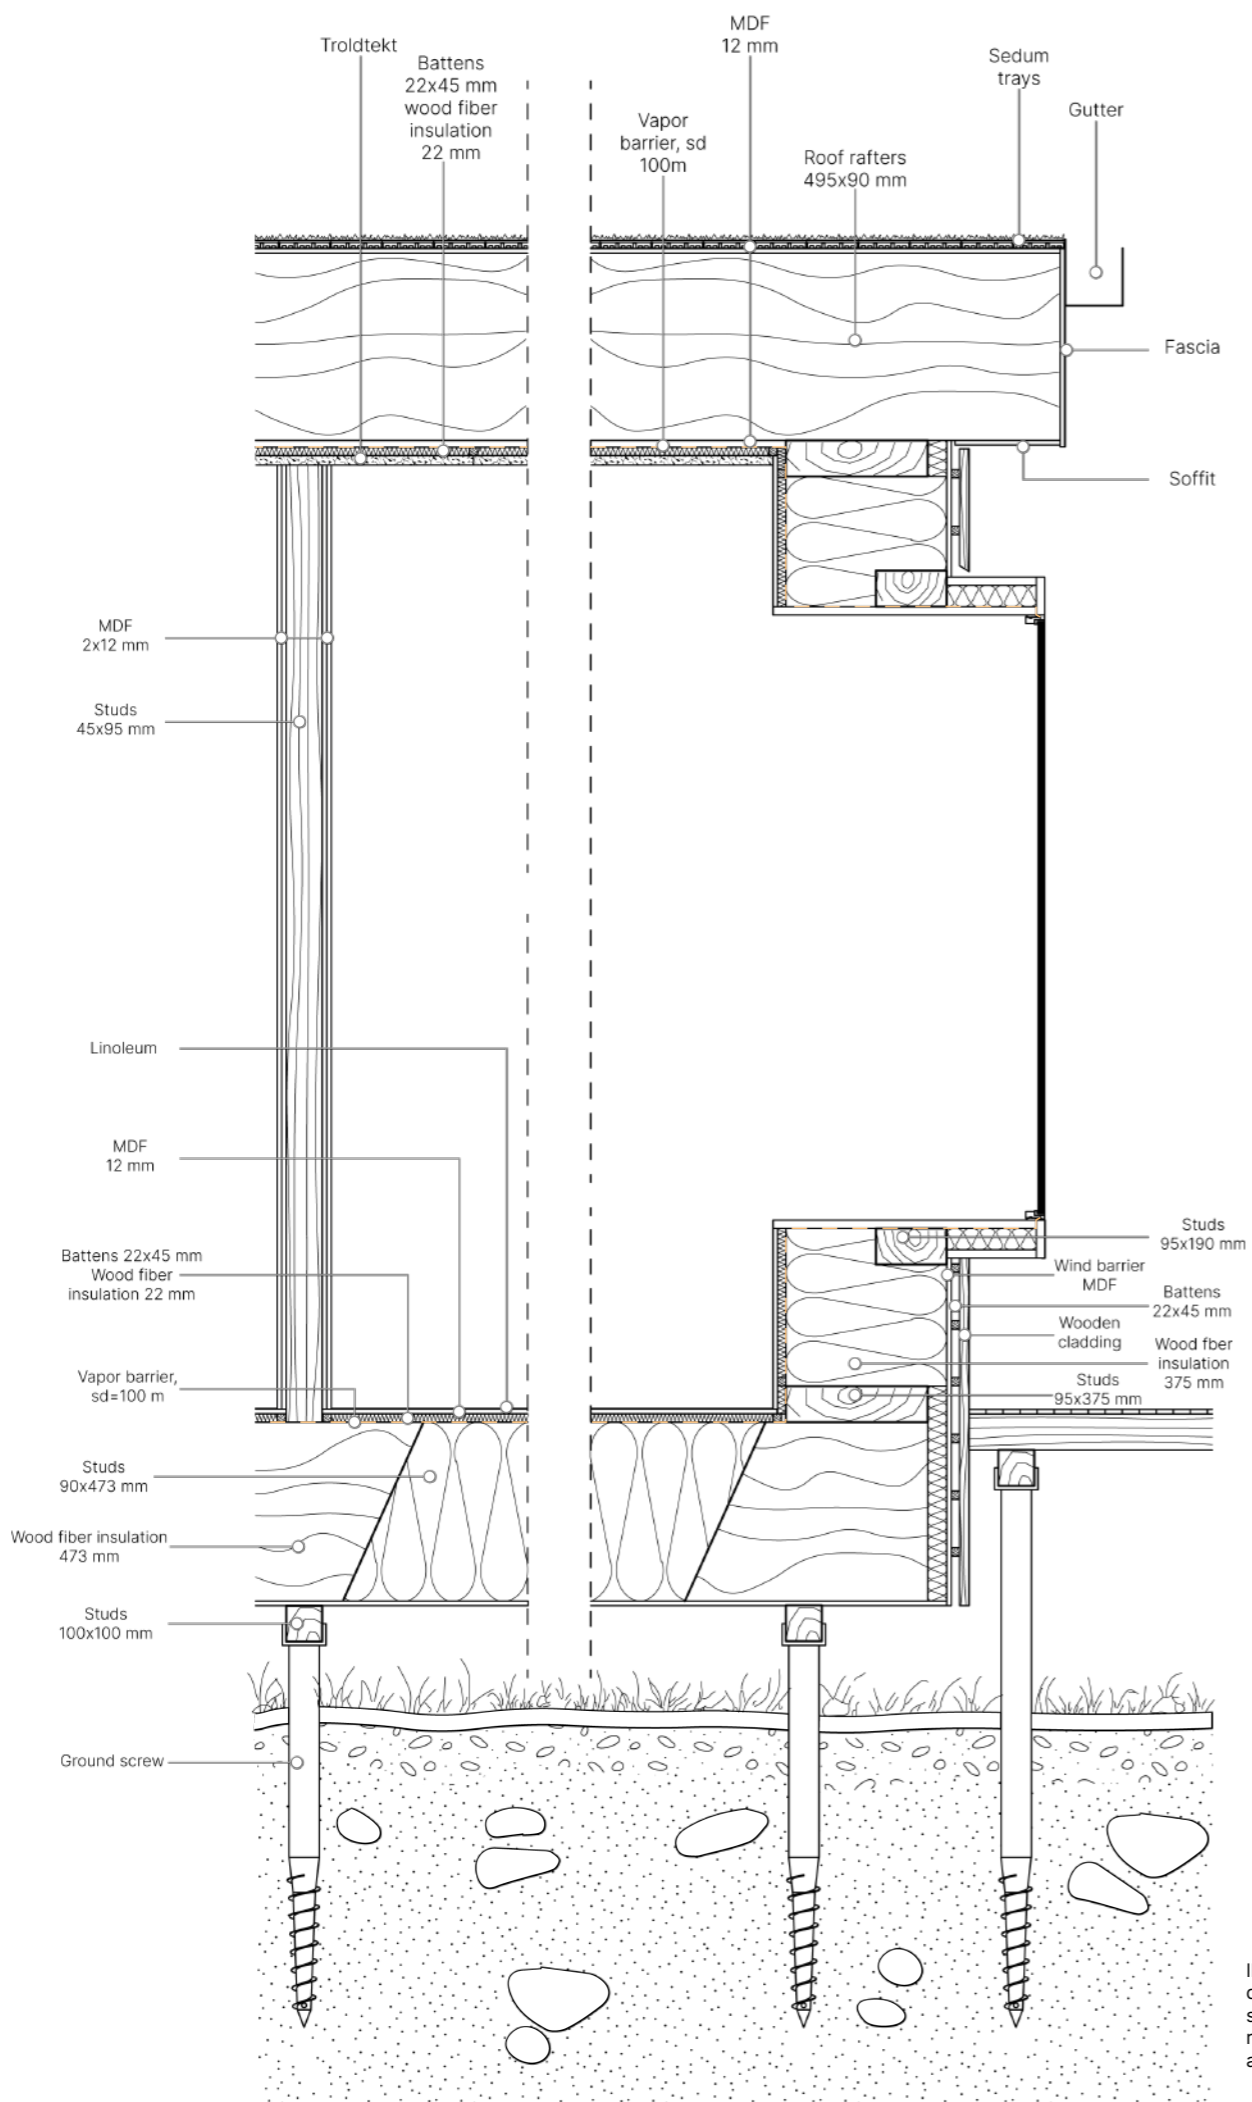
Own technical Detail 1:20 divided technical Detail from group room showing the window niche and the separating wall inside the architectural element
